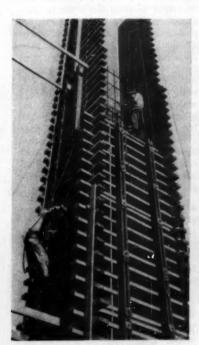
FULL HEIGHT COLUMN form under construction. Note panel corner arrangement detail and well tied wales.
